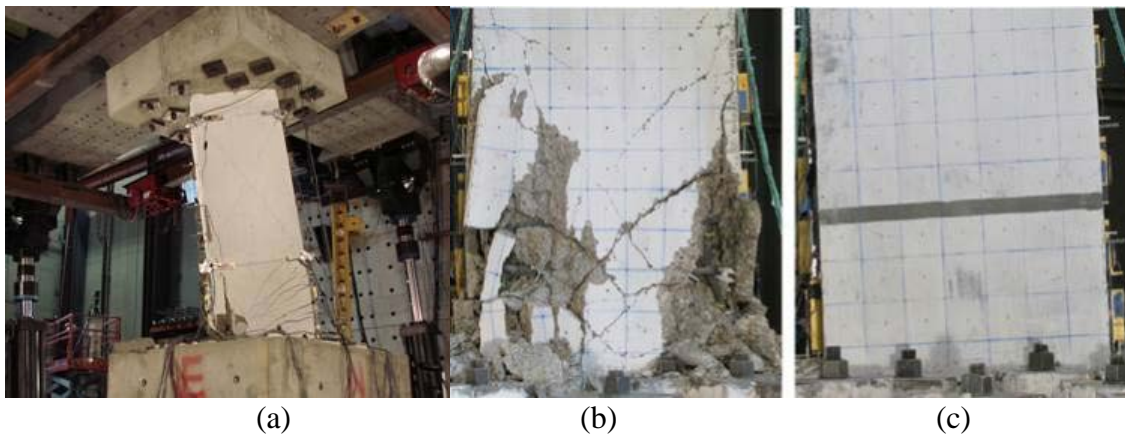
Experimental testing at NSF MAST laboratory (a) Test setup, (b) conventional reinforced concrete column, and (c) UHP-FRC concrete column.
